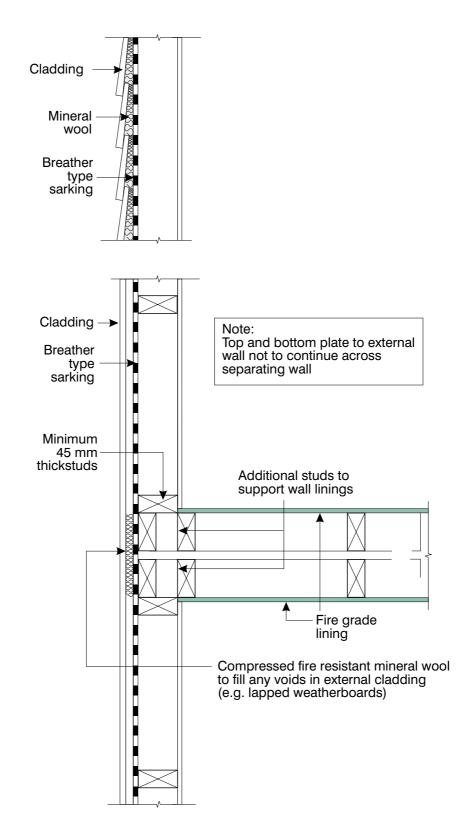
INTERSECTION WITH NON-ALIGNED EXTERNAL WALL
